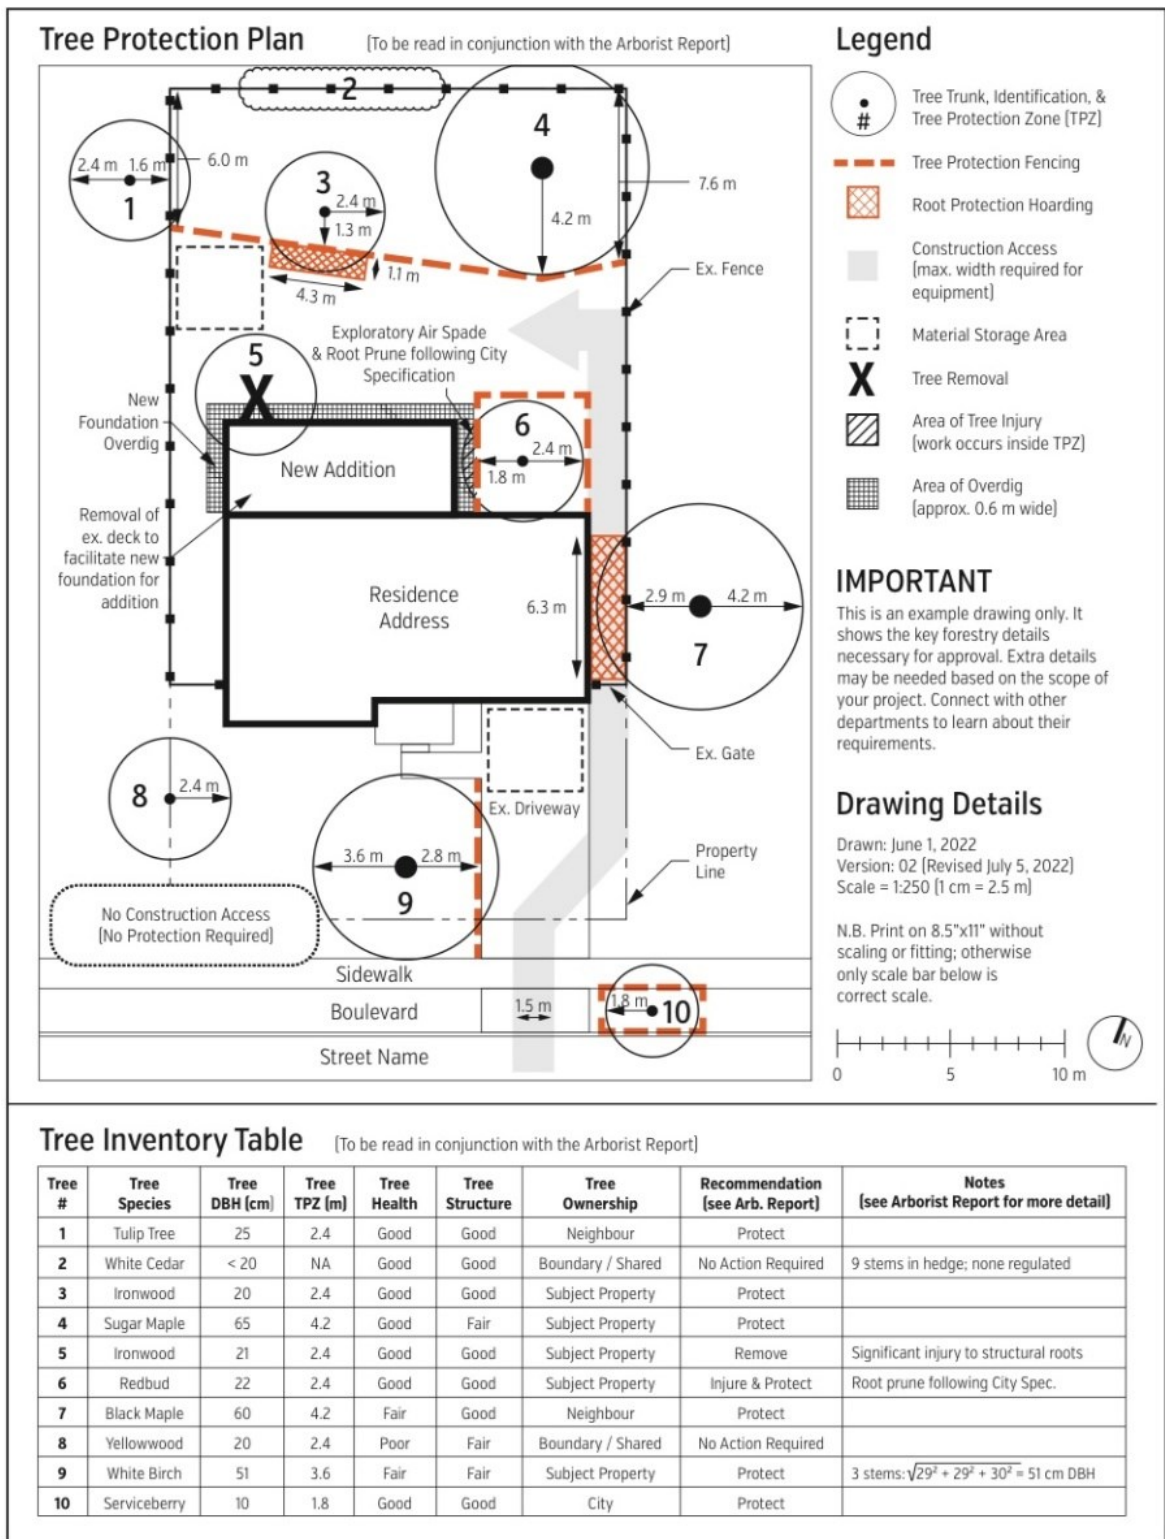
Example of a Tree Protection Plan for an addition (photo by Scott Mooney)
